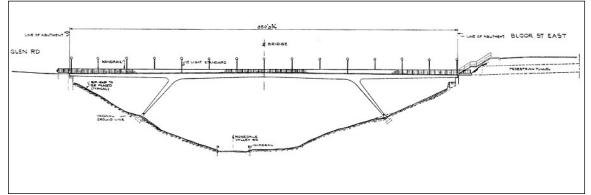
A drawing of the west elevation depicts the general arrangement of the three-span Glen Road Pedestrian Bridge [Albery, Pullerits, Dickson & Associates Ltd., 1973].
